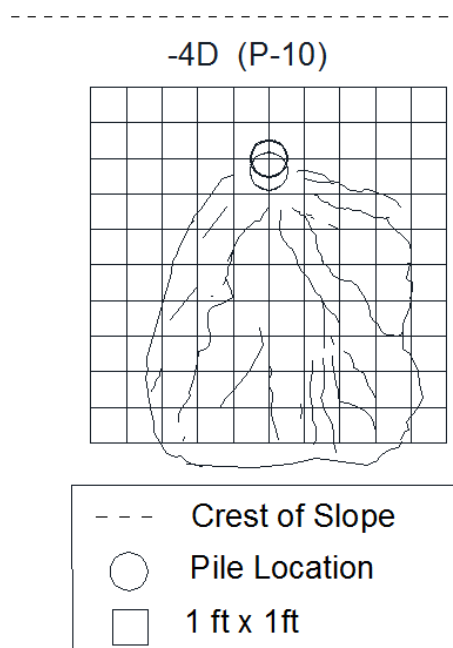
Cracking patterns for the -4D (on slope) pile
